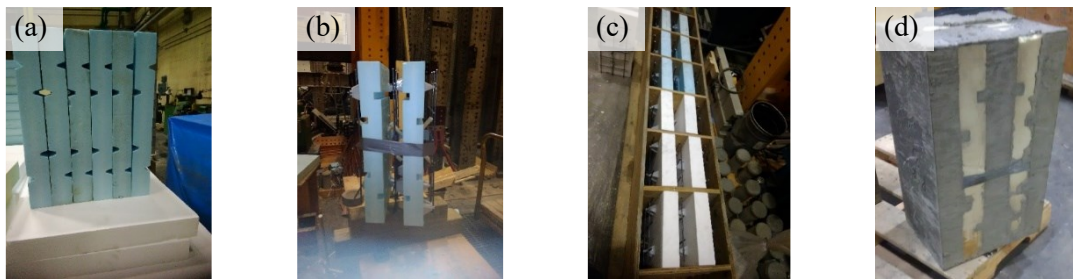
Specimen fabrication (a) XPS insulation with pre-cut notches, (b) Assembly of sample components (connectors, reinforcement, and insulation), (c) Specimens in formwork and, (d) Demoulded sample.
